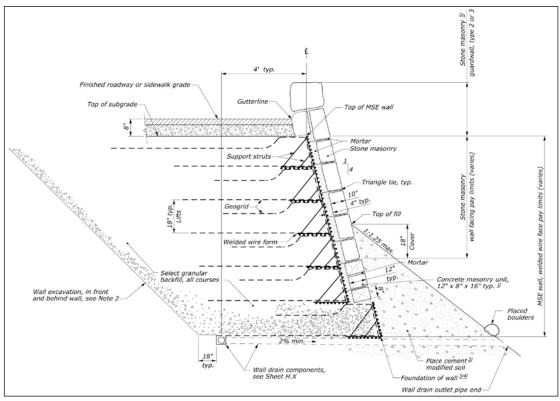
MECHANICALLY STABILIZED EARTH WALL TYPICAL
